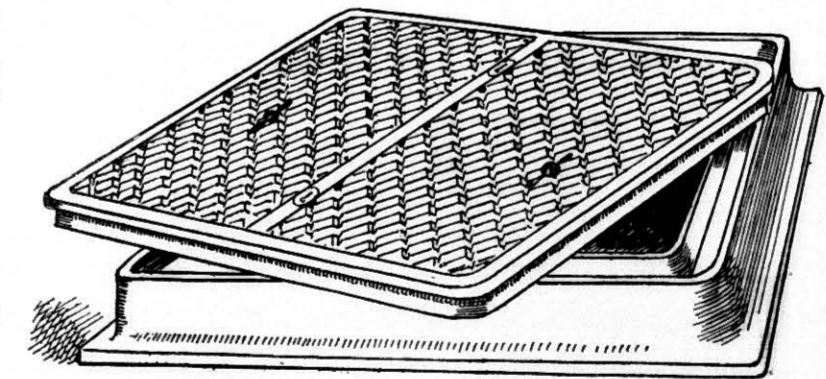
Adams's Air-tight Manhole-cover (Light Pattern).
